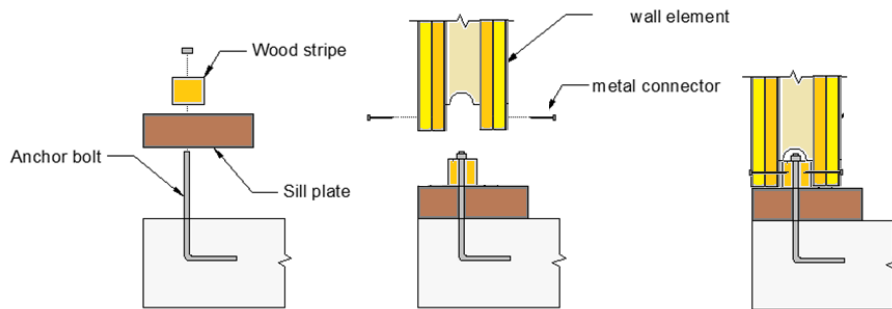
Anchor bolt connection for wall-to-concrete foundation.
